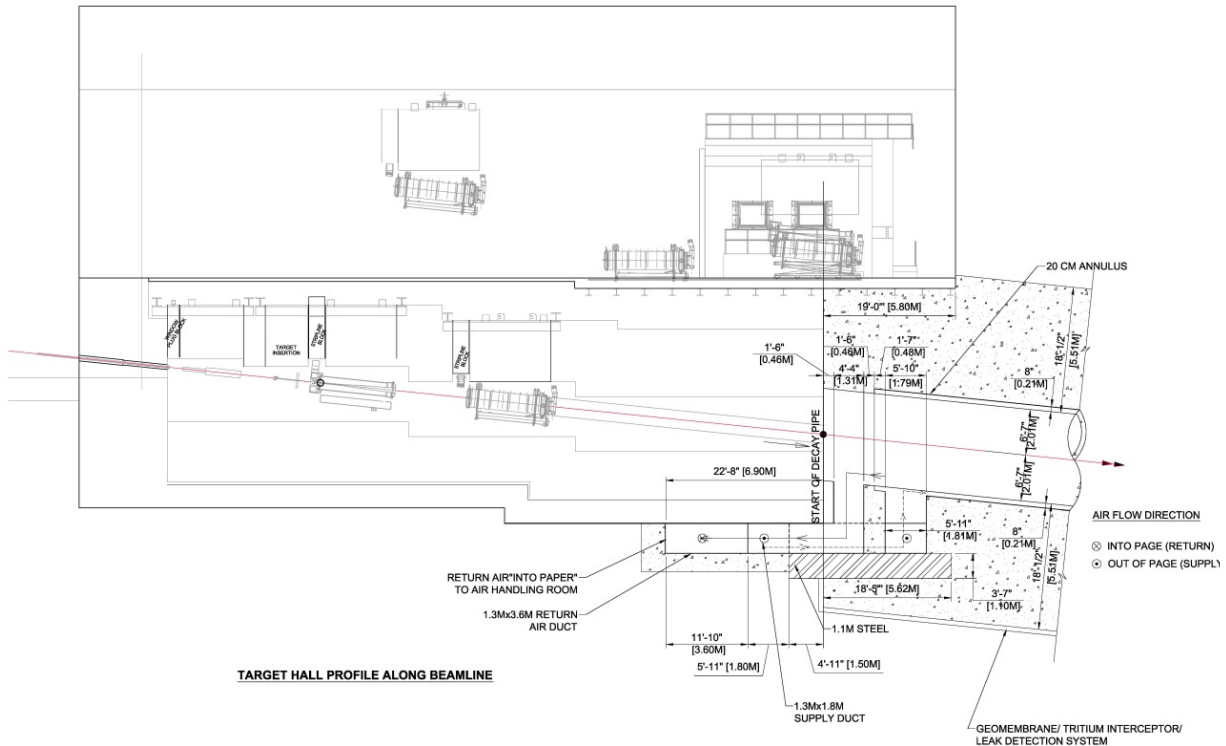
Target Chase Long Section; Decay Pipe Cooling Ducts.
